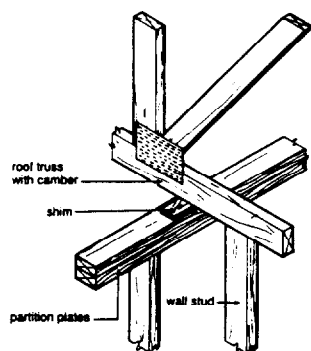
For roof trusses fabricated with a camber, insert shims under bottom chords to prevent pulling out camber.
